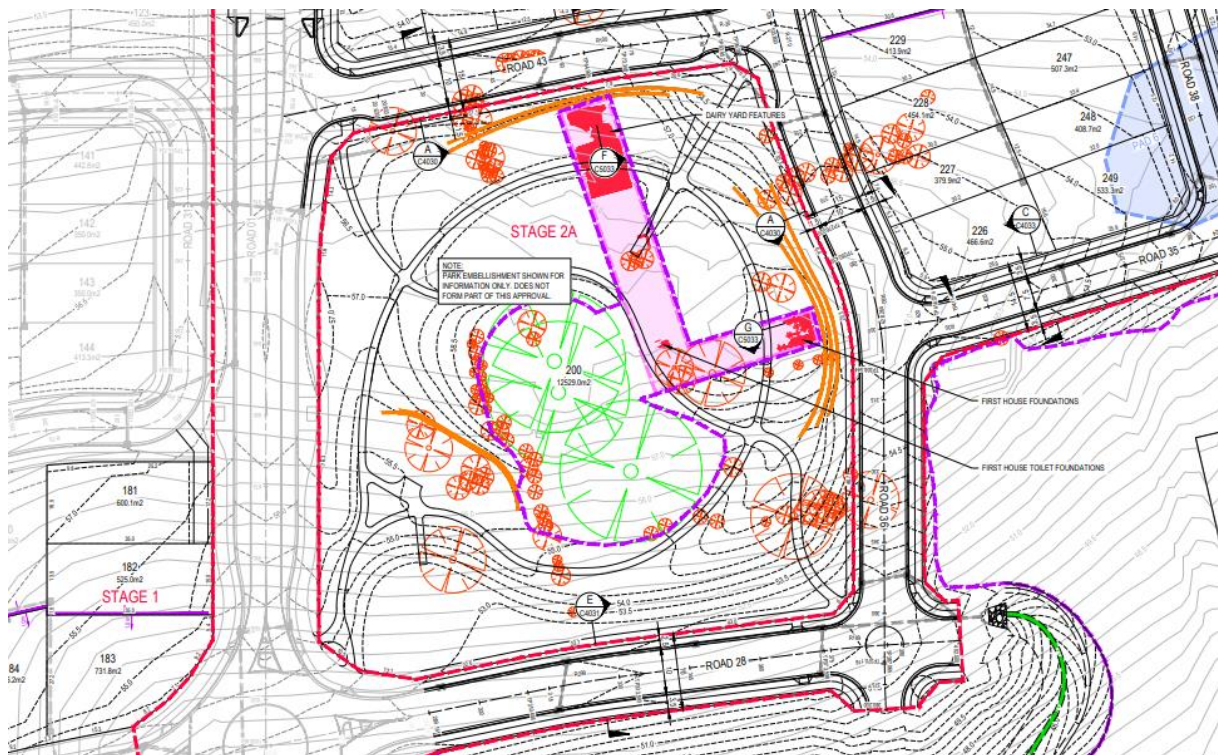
The stamped subdivision plan showing the proposed public park layout and Conservation Management Area boundary (purple). (Source: Cardno 2022)
